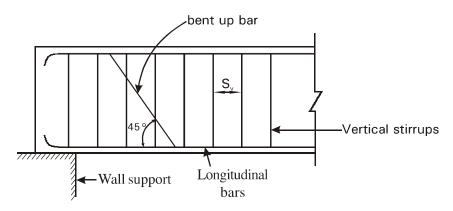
Beam with bent up bars along with vertical stirrups
